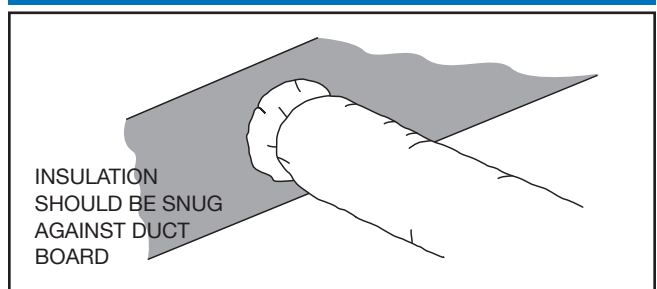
E. Install Flexible Duct to Collar According to Manufacturer's Instructions
